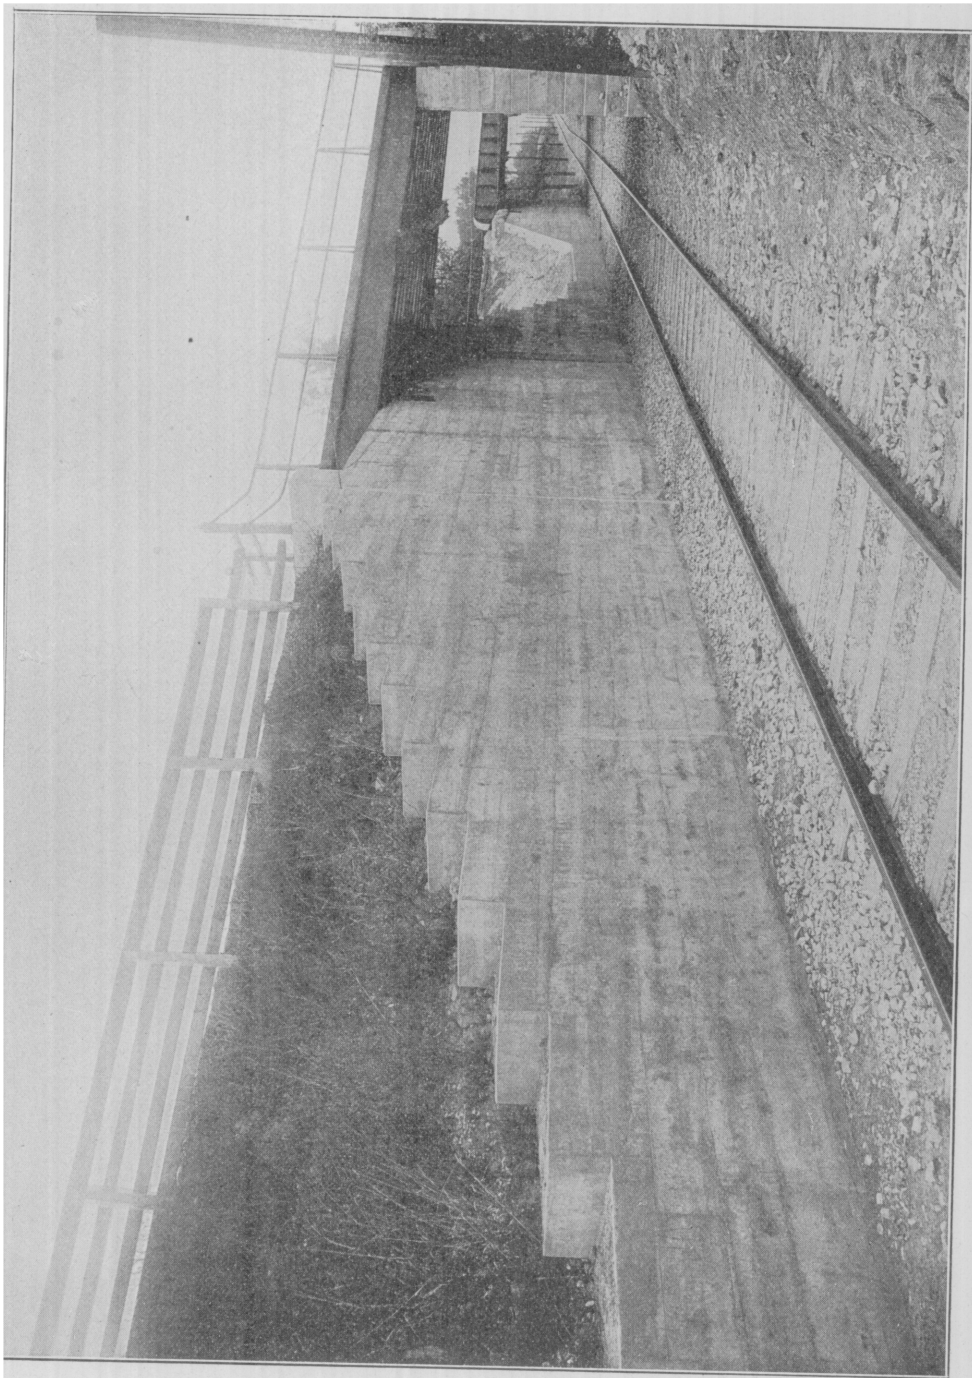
A Concrete Abutment on the T. & M. R. R., Near Toledo, Ohio.
